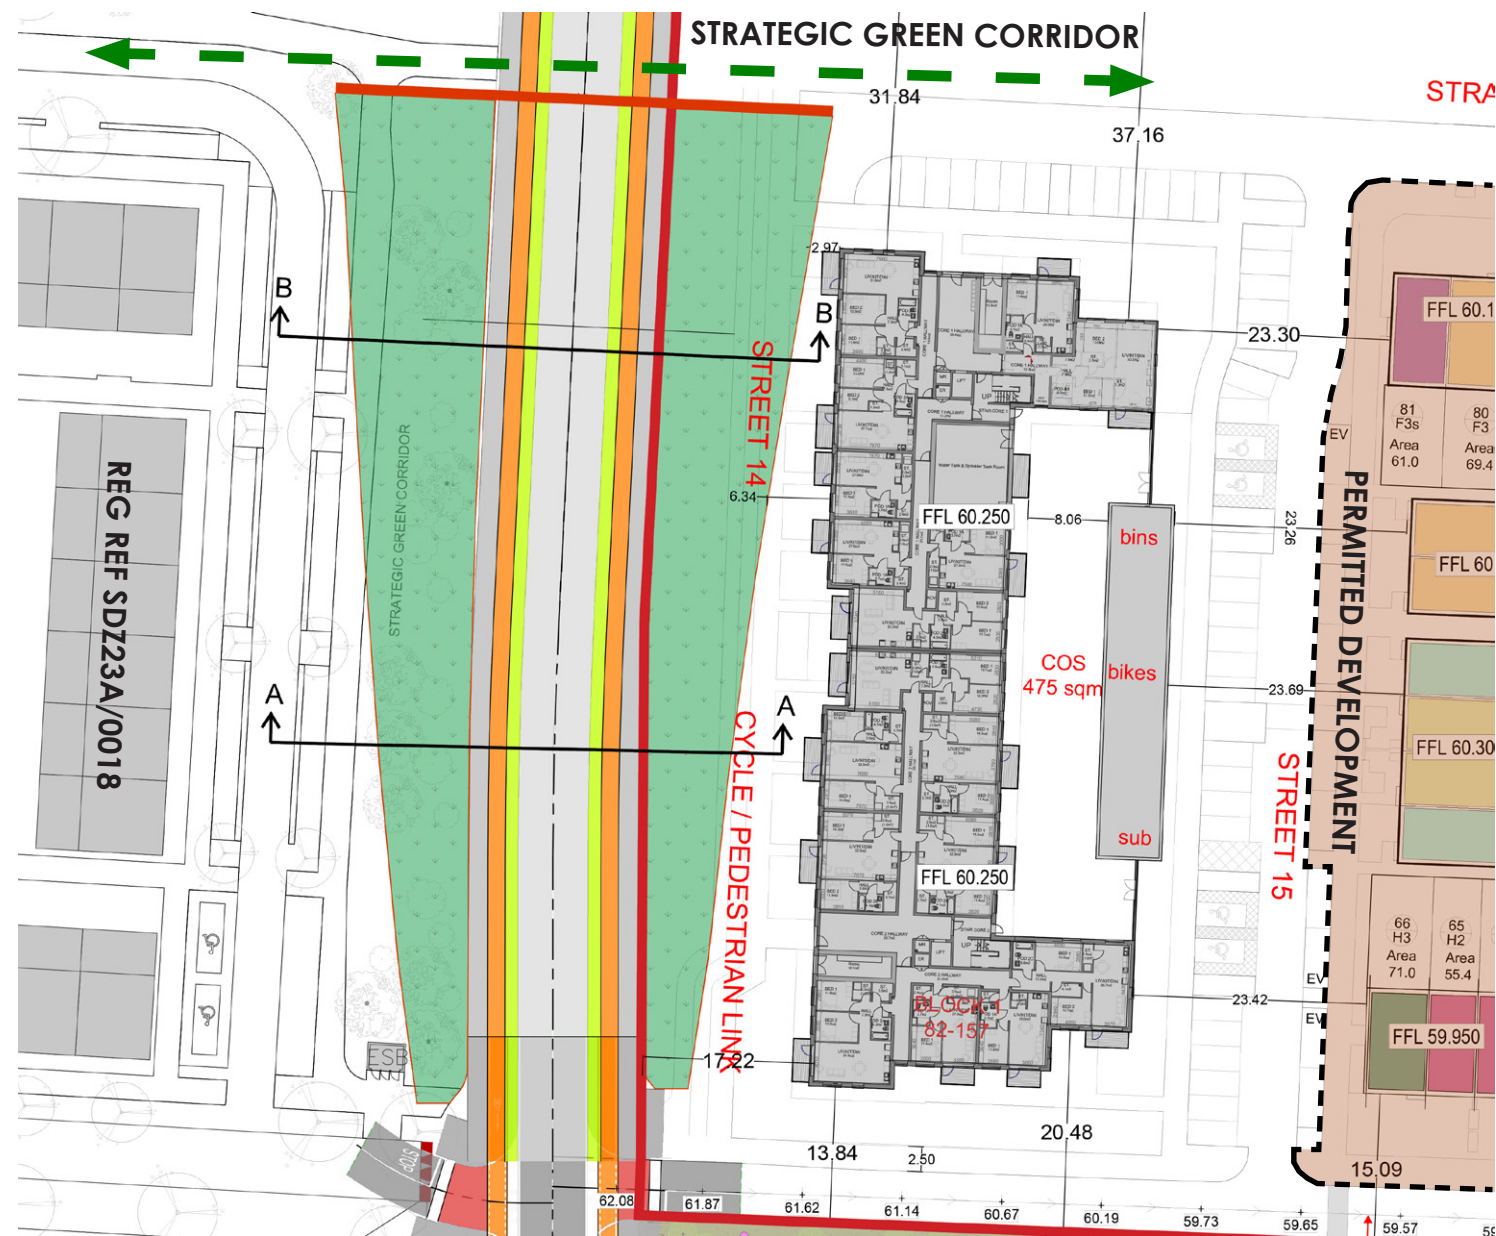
SITE PLAN - BRIDGE EMBANKMENT FEASIBILITY
